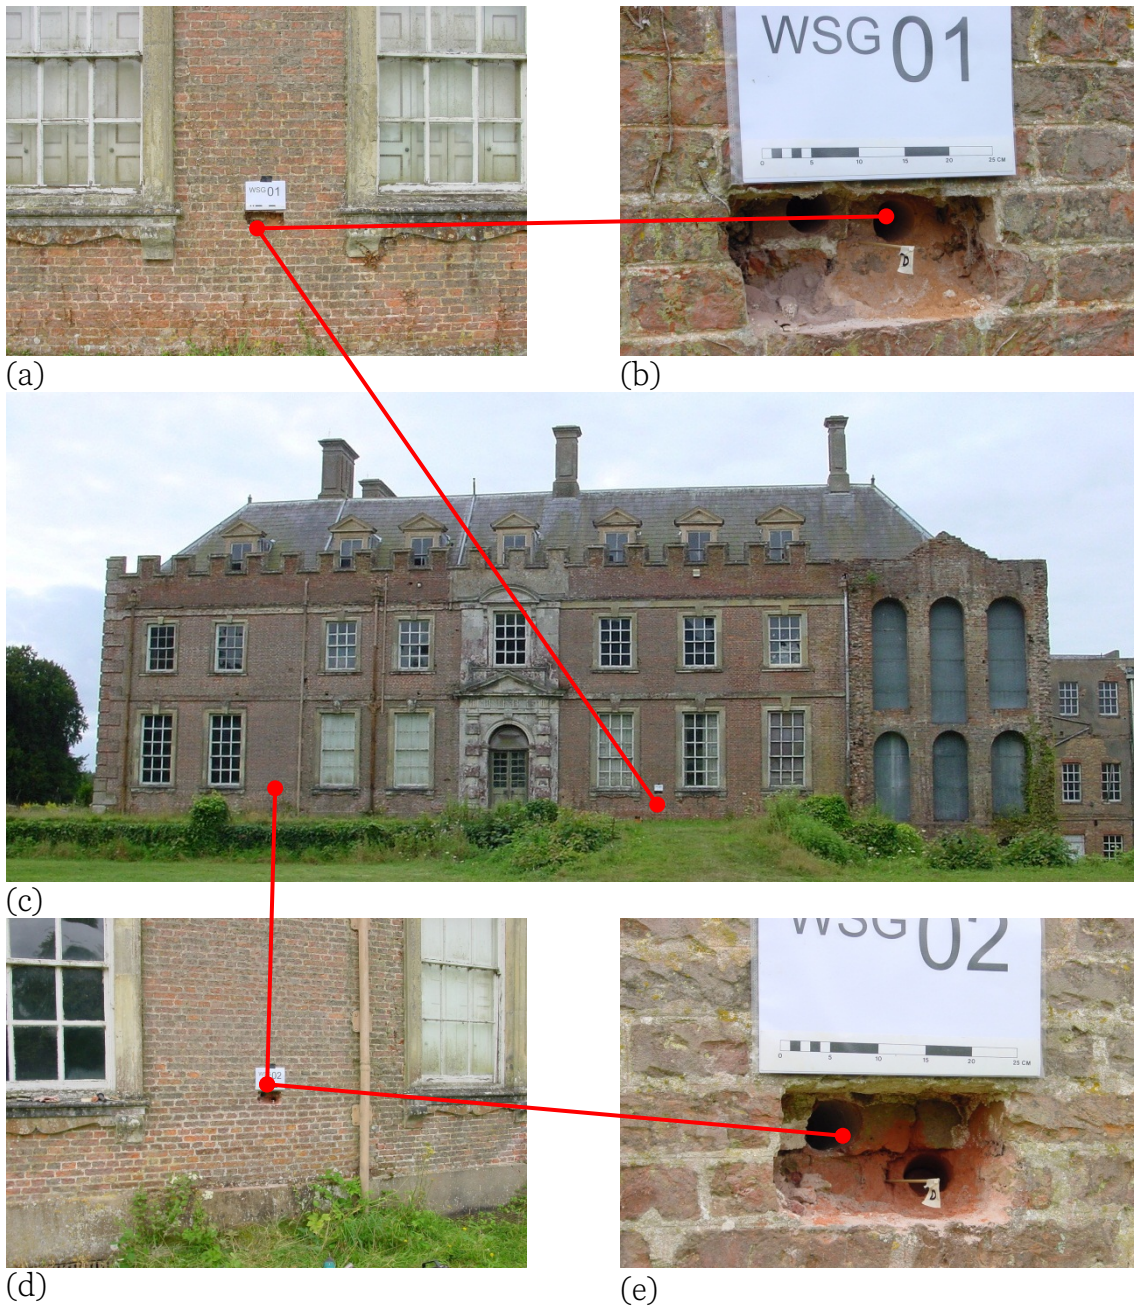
(a) section of north-facing wall showing location of WSG-01, (b) close-up of sampling location WSG-01, showing the position of cores WSG-01-1 (left), WSG-01-2 (right), and the dosimeter (flag D), (c) north-facing wall of St Giles House showing white card to right of entrance that indicates the location of WSG-01 and white card to left of entrance that indicates the location of WSG-02, (d) section of north-facing wall showing location of WSG-02, and (e) close-up of sampling location WSG-02 showing cores WSG-02-1 (upper left) and WSG-02-2 (lower right)
